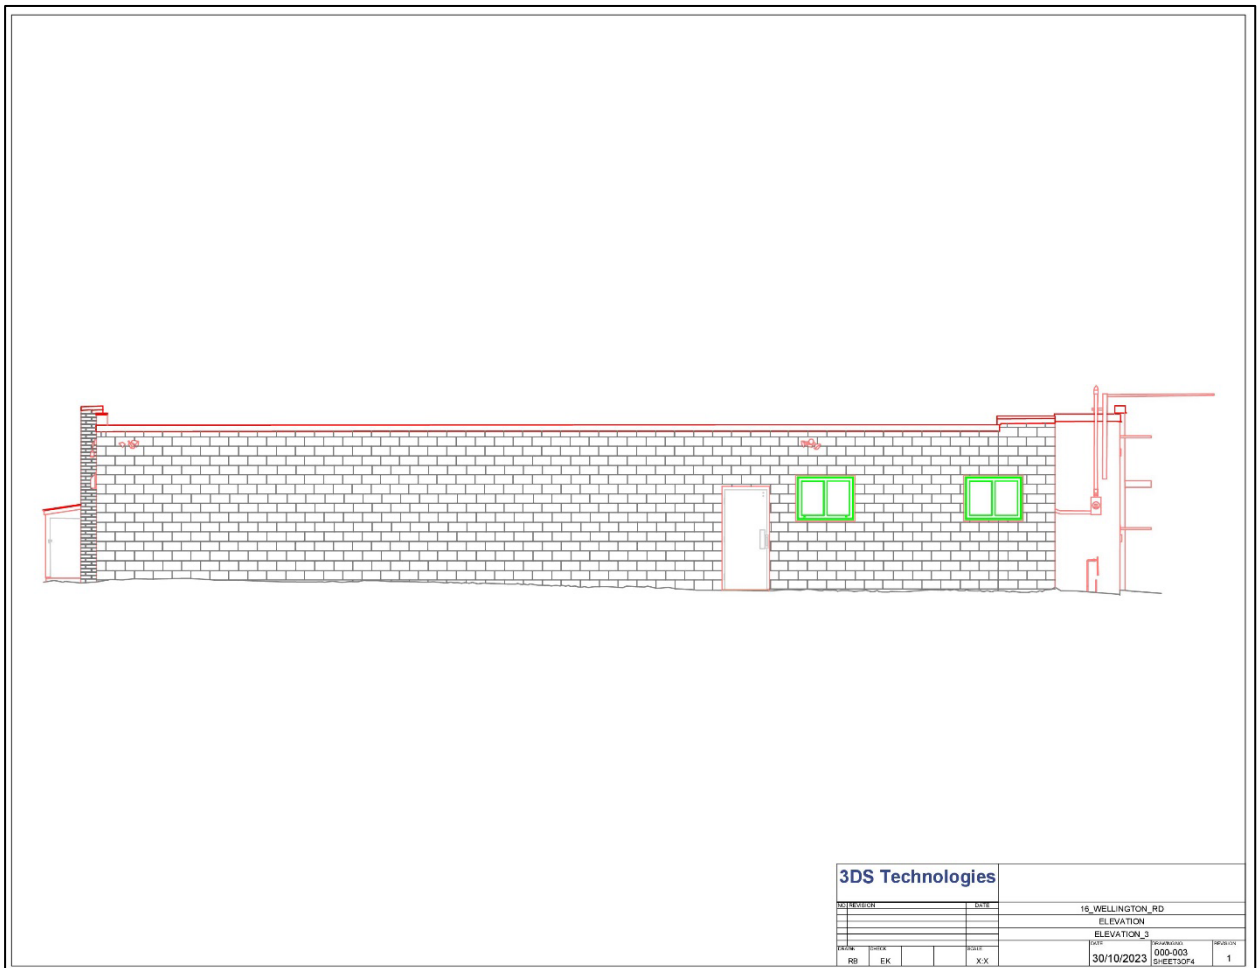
East elevation of the building at 16 Wellington Road (3DS Technologies, dated October 30, 2023).
